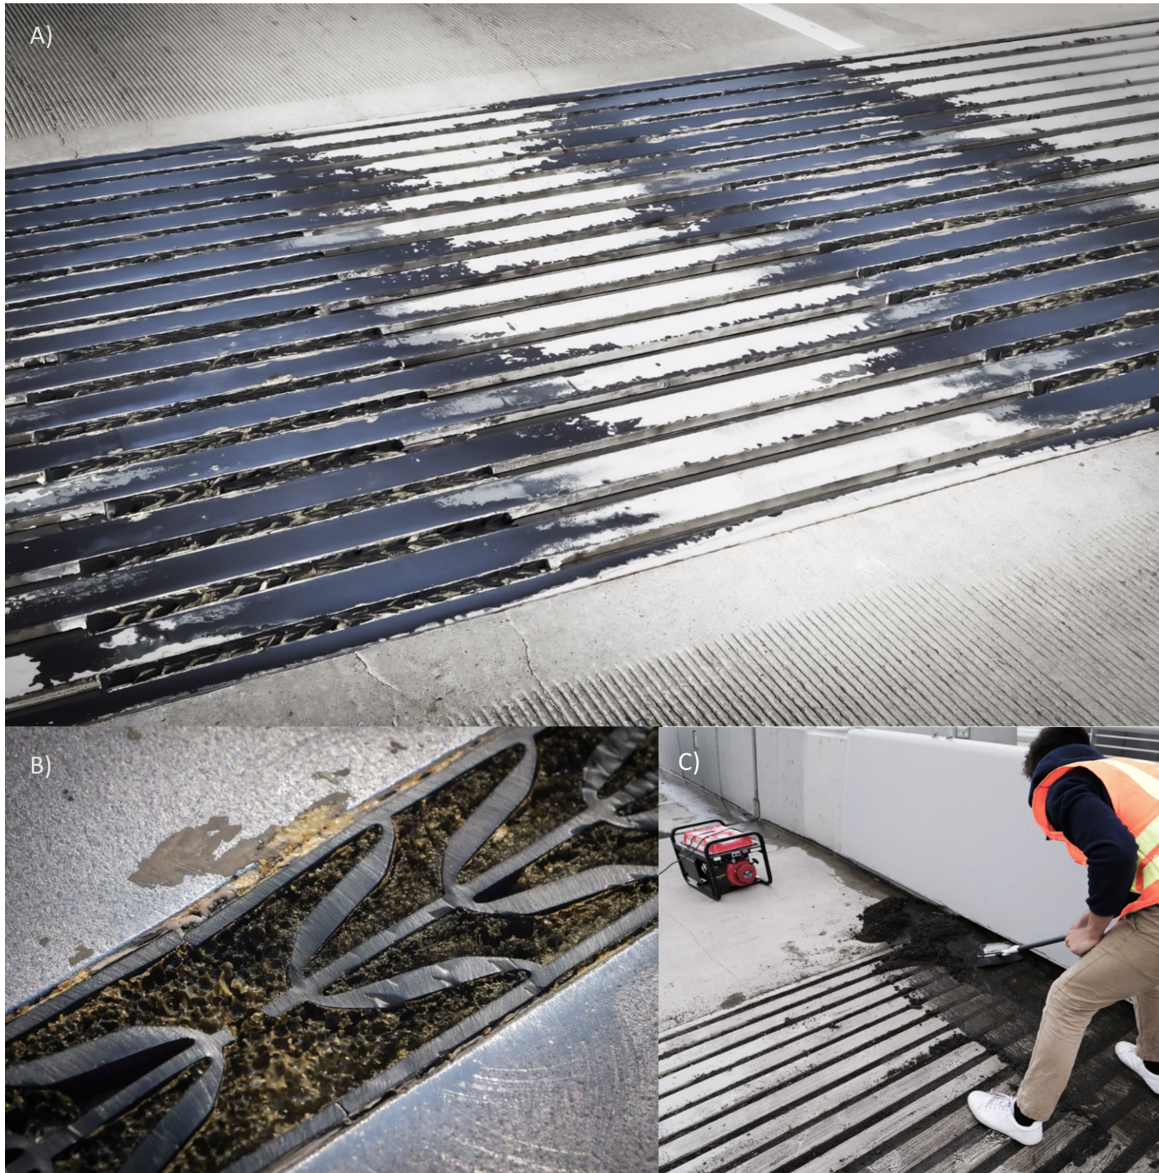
Installation of MEJ treatment. (A) Support structure after four weeks of wear. (B) Detailed view of the structure. (C) Cleaning out the expansion joint before installation.
